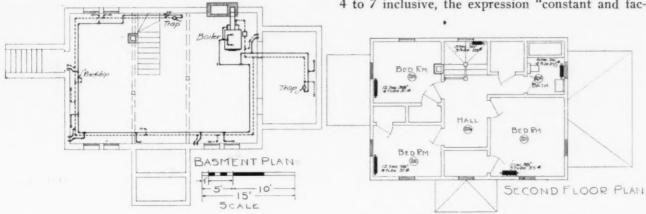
Above basement plan showing location of boiler and connecting piping.
